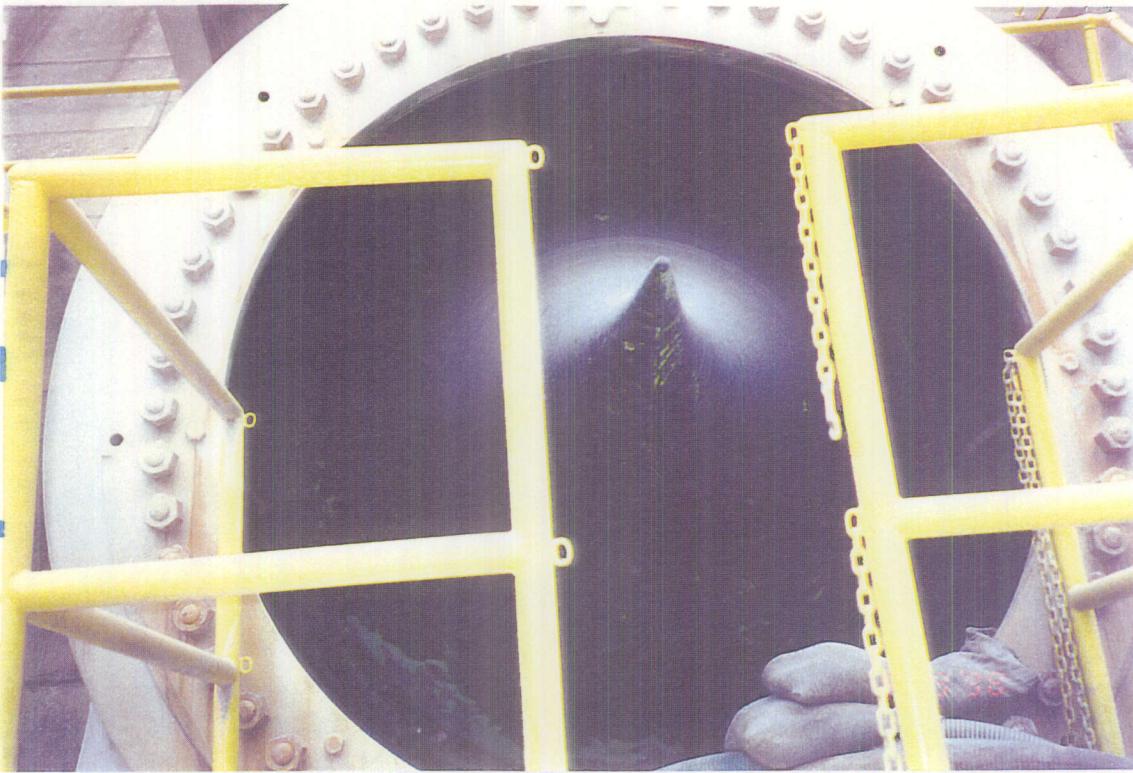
Morris Dam - Needle Valve 6 - View of needle and downstream flange.
